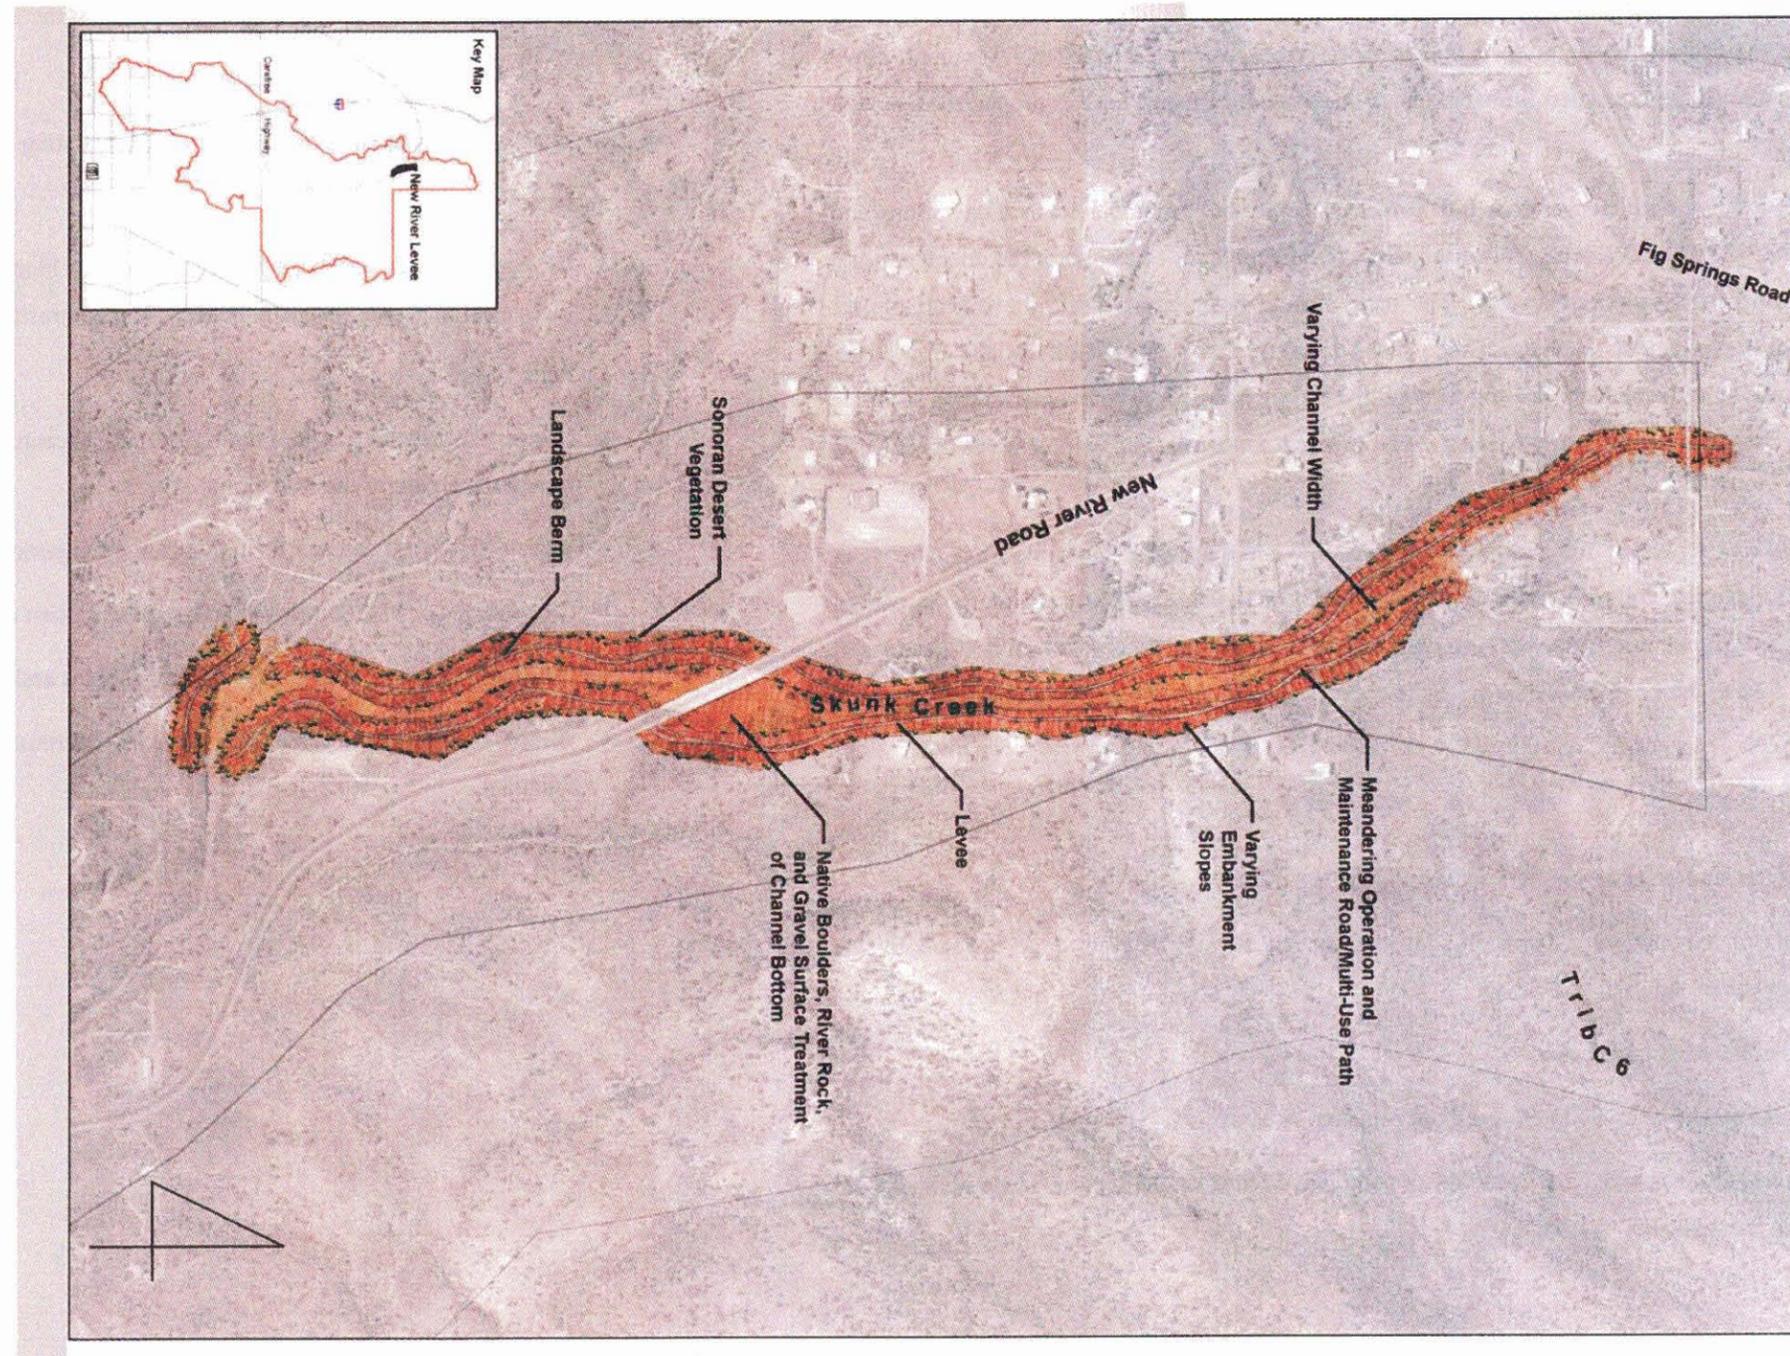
Recommended Alternative – New River Road Bridge Levees Aesthetic Treatments
